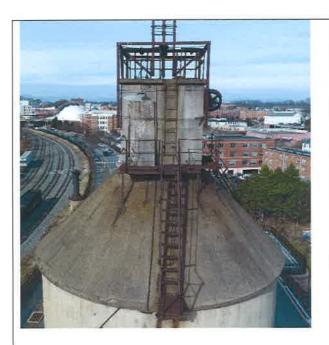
Roof from the SE Side. Stairs and catwalk are to be removed. Door needs to be replaced
